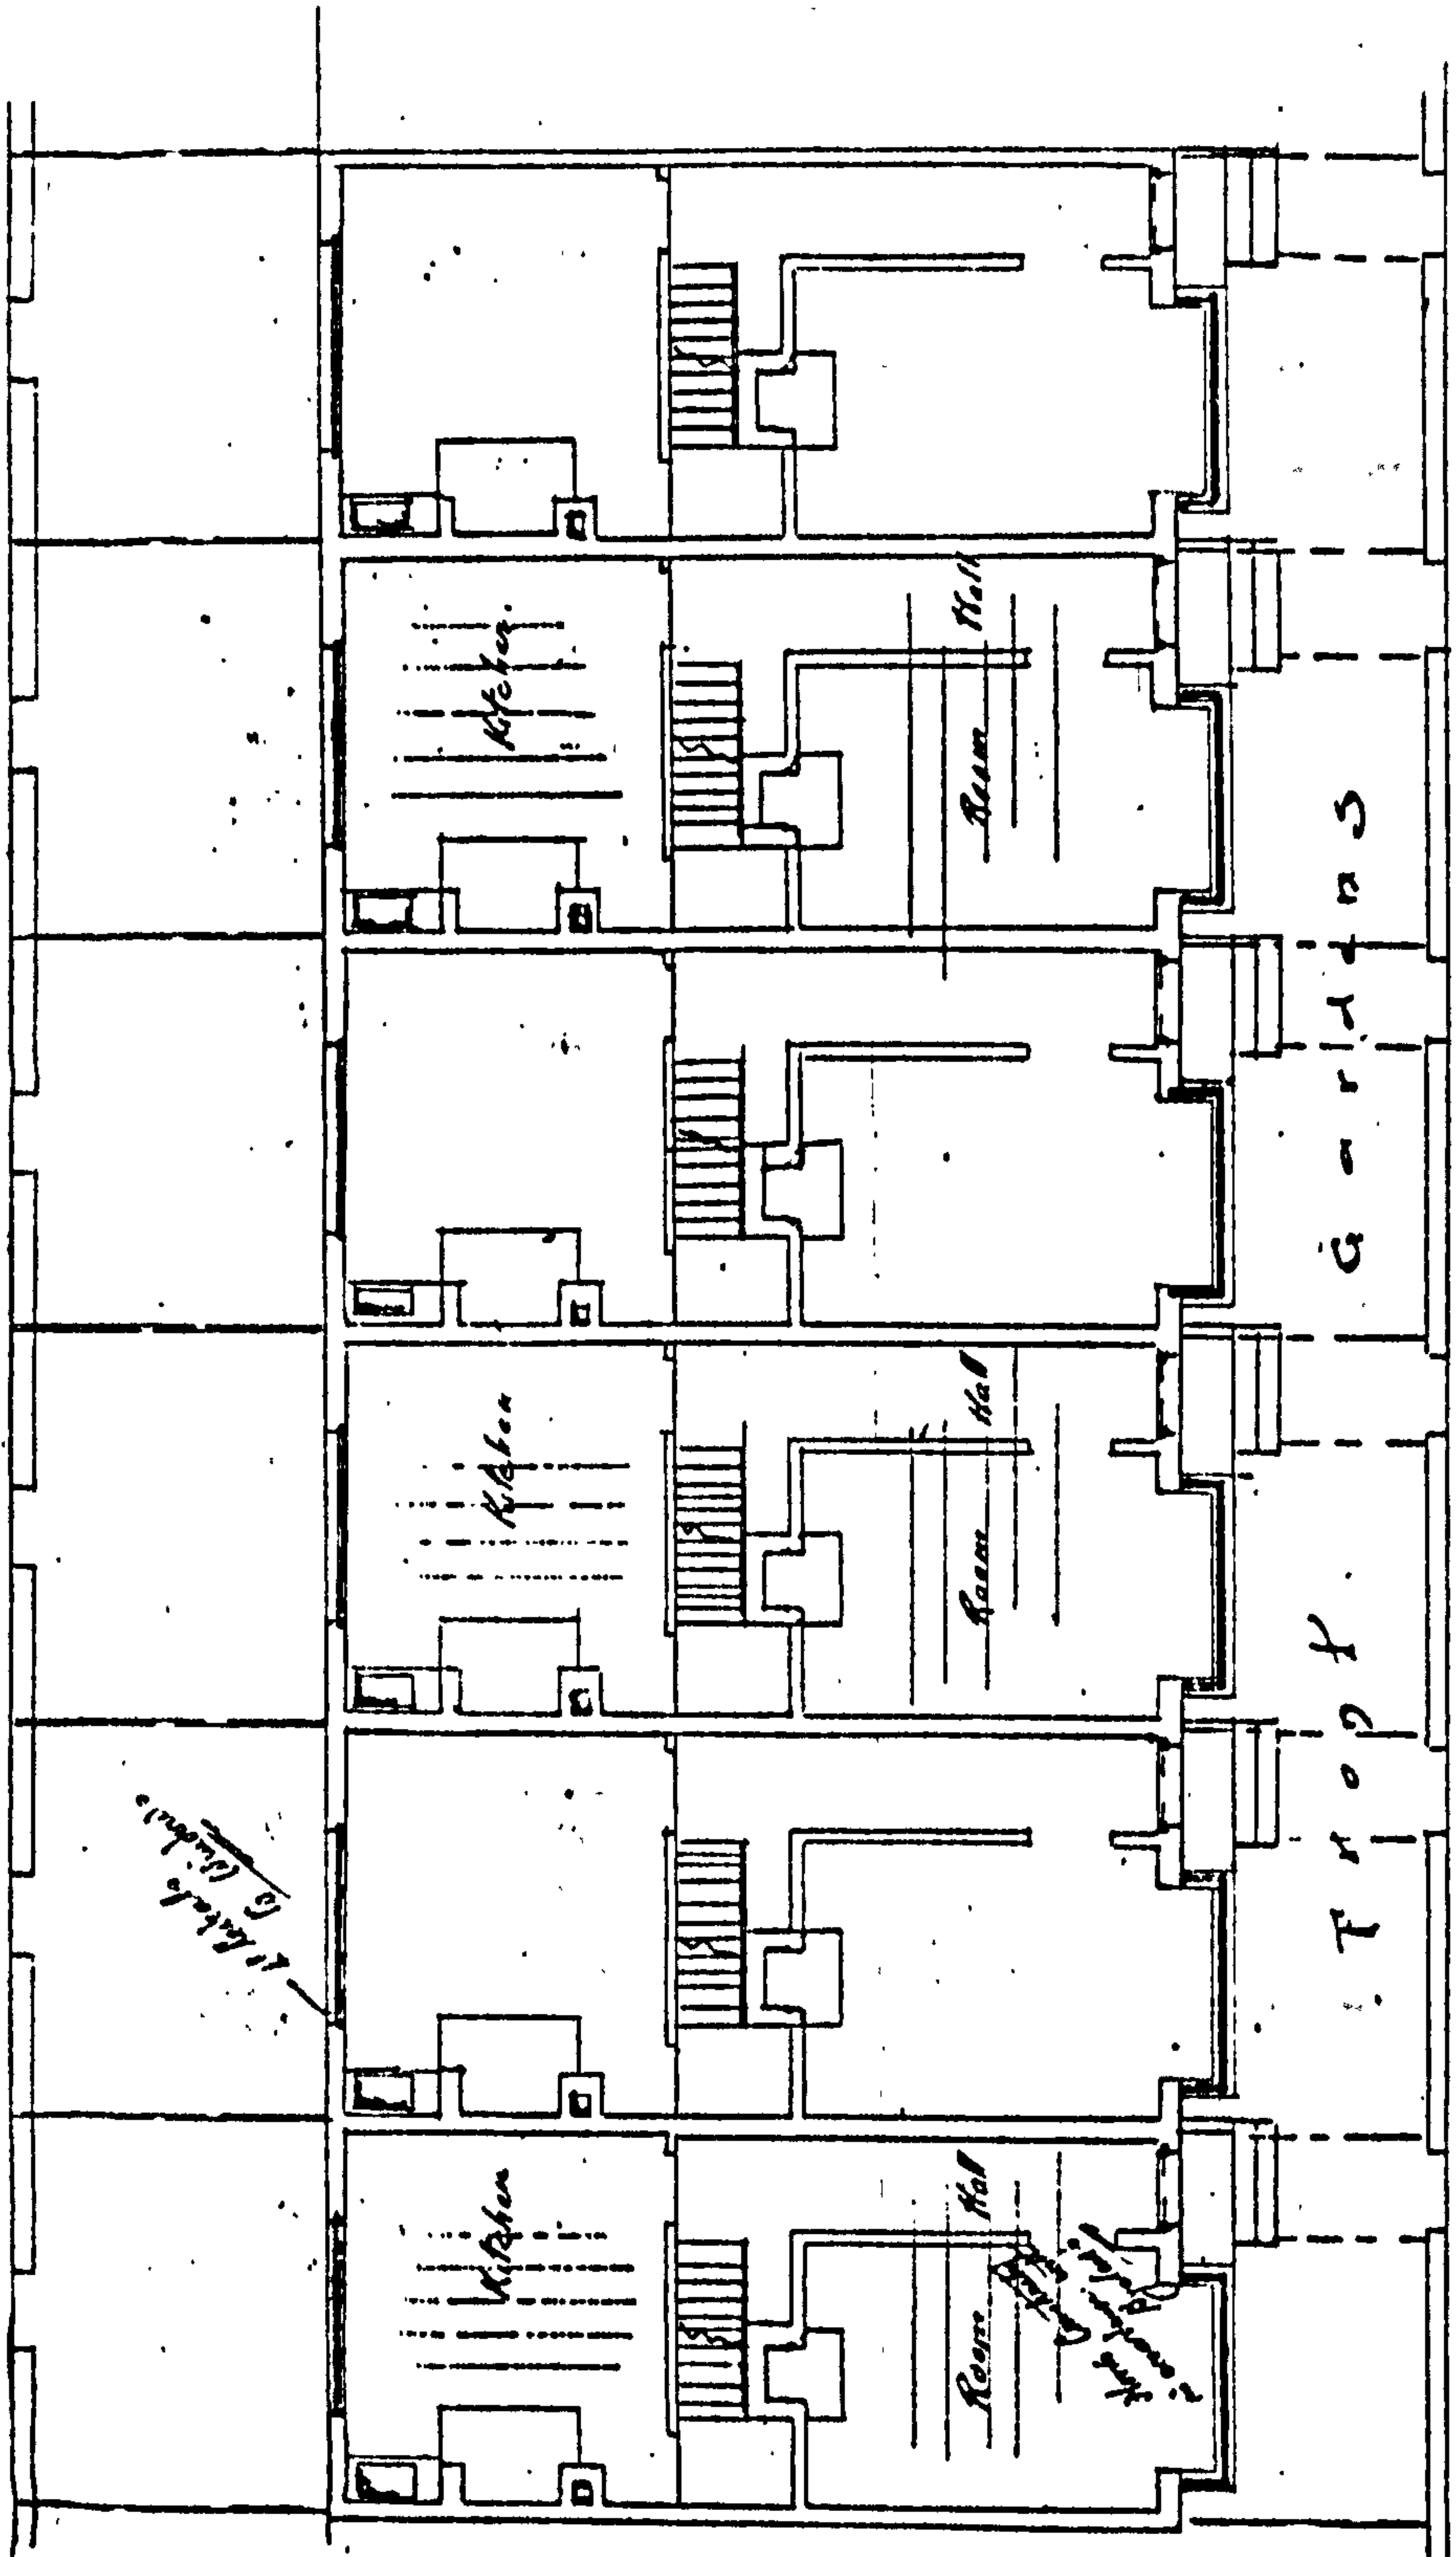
Deposited ground floor plan of three through houses, Brudenell View (W.A. Hobson 1892).
